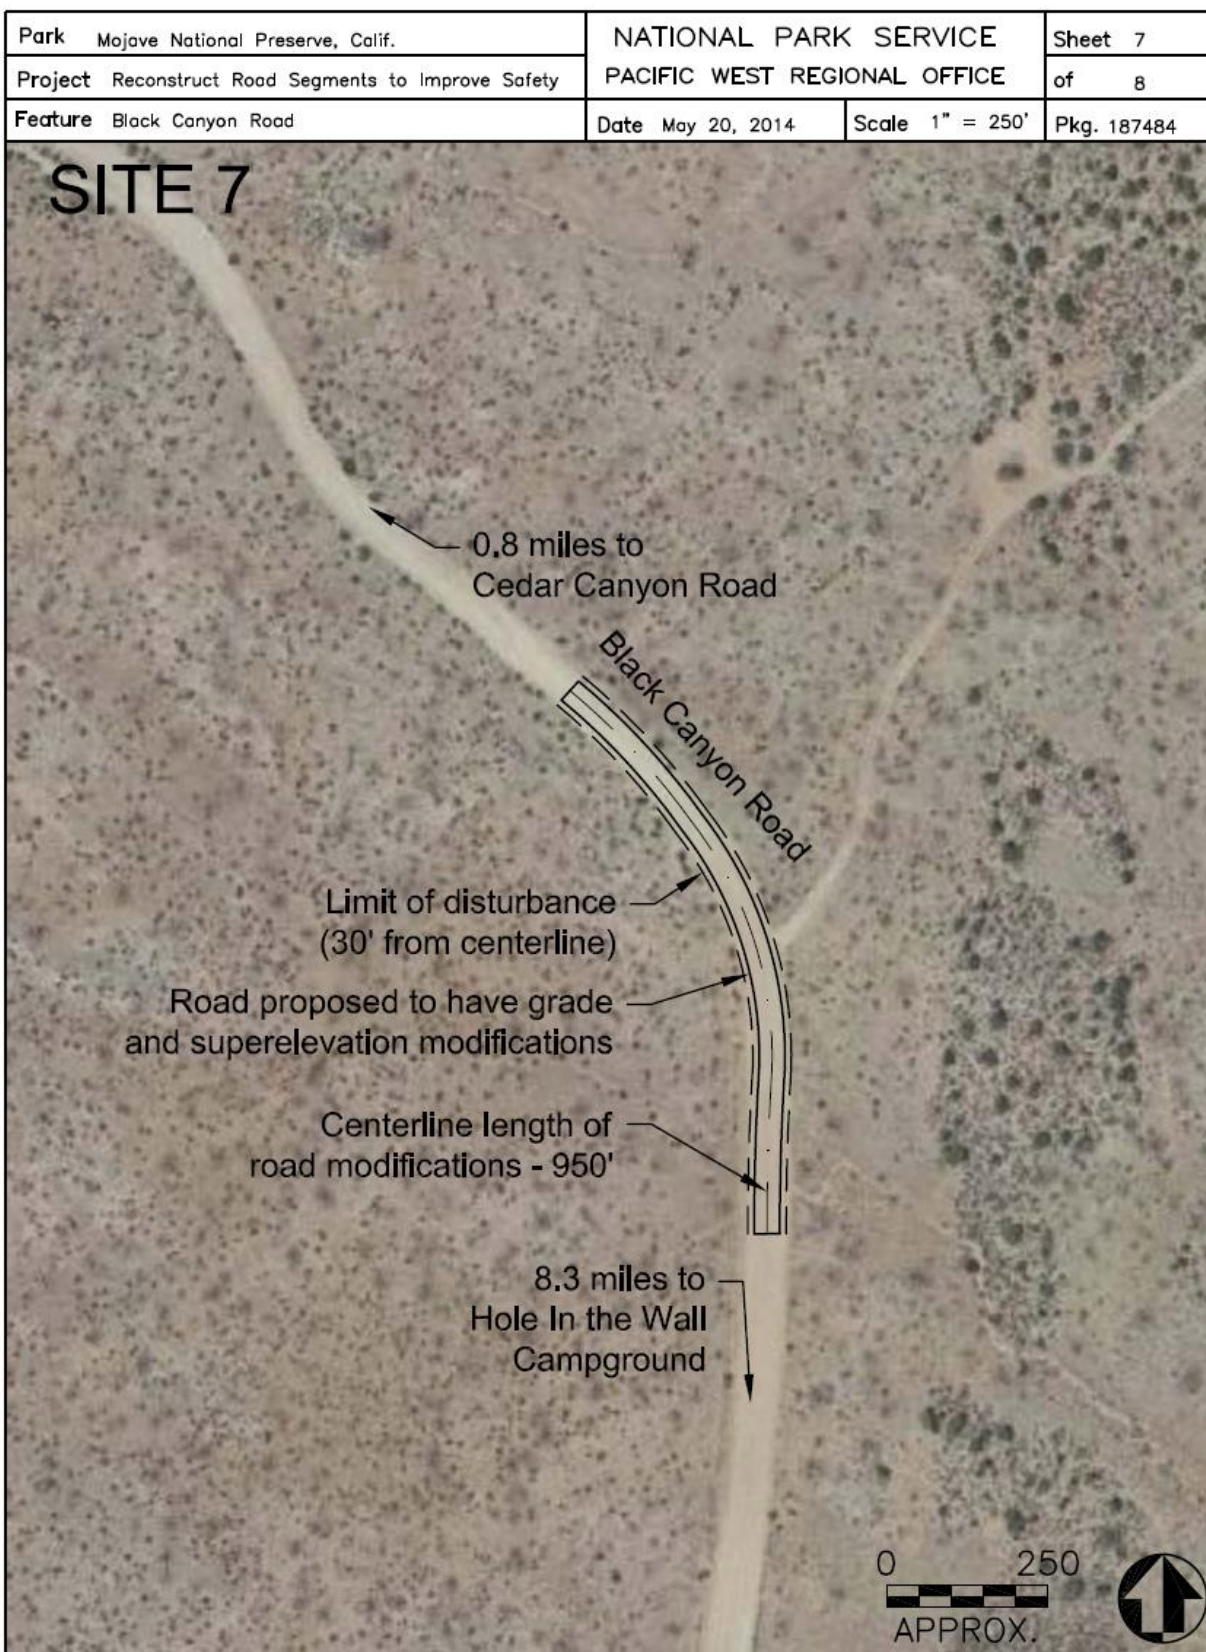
Roadway Improvements on Black Canyon Road (Site 7)
